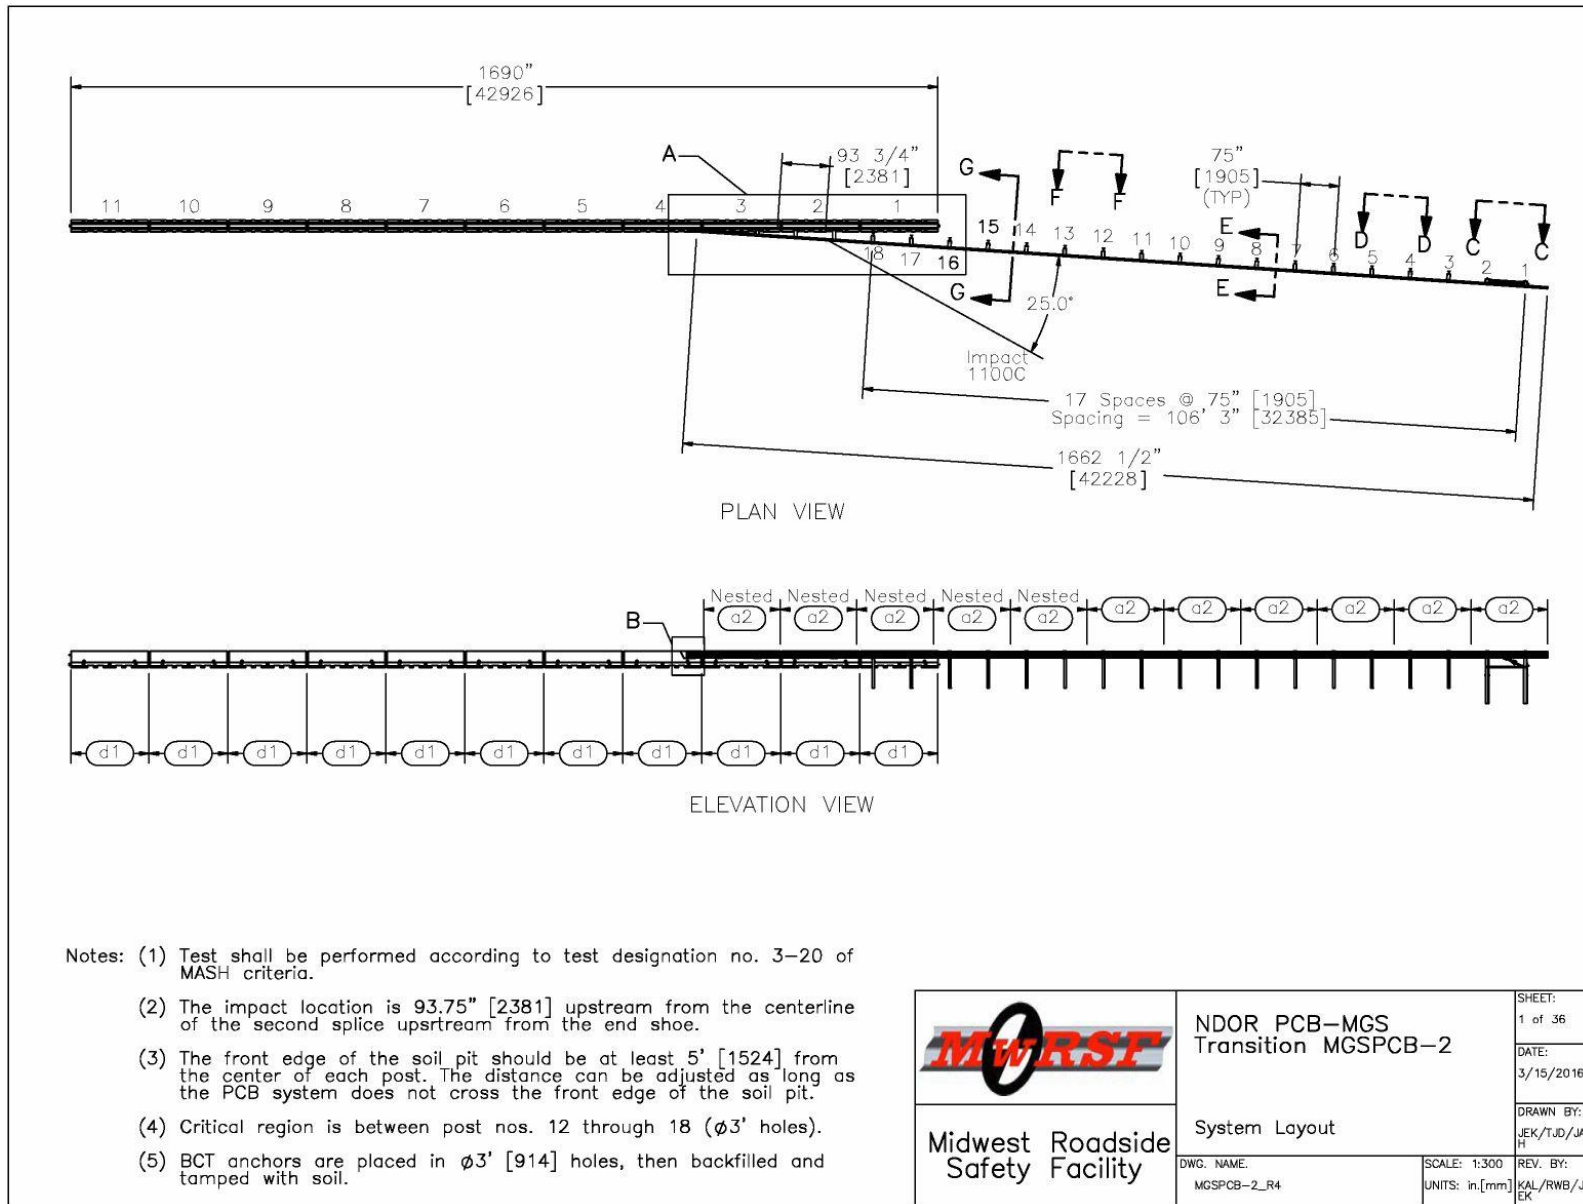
Test Installation Layout, Test No. MGSPCB-2
